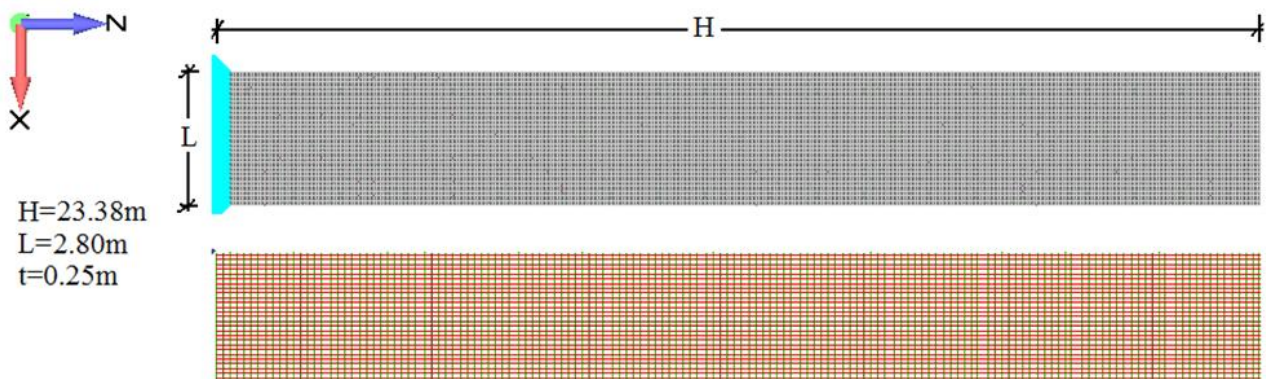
RC SHEAR WALL WITH 17,080 HEXAHEDRAL ELEMENTS AND 13,192 INITIAL STEEL BAR ELEMENTS.
